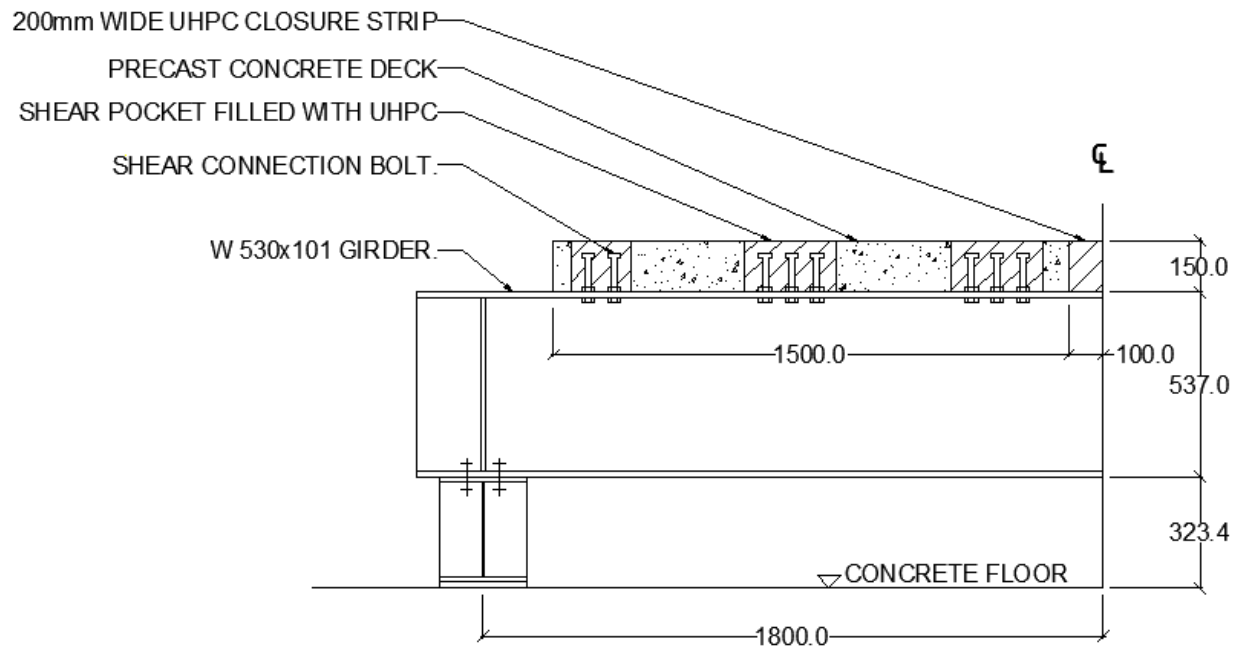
Elevations of test setup (dimensions in mm u.n.o.).
